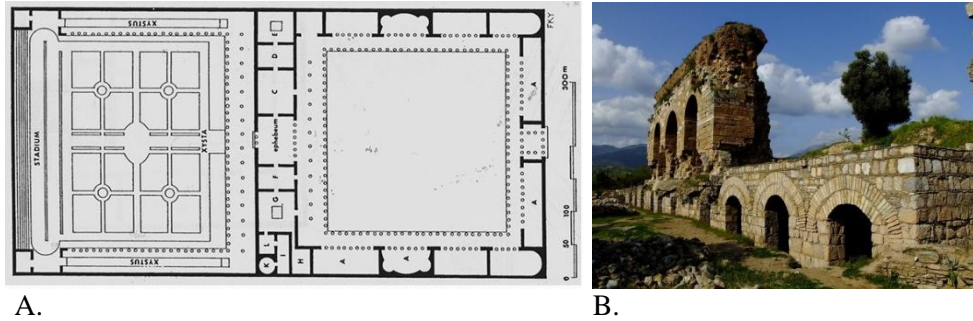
A.Gymnasium plan with palaestra and surrounding rooms (Source: Yegül, 1992)
